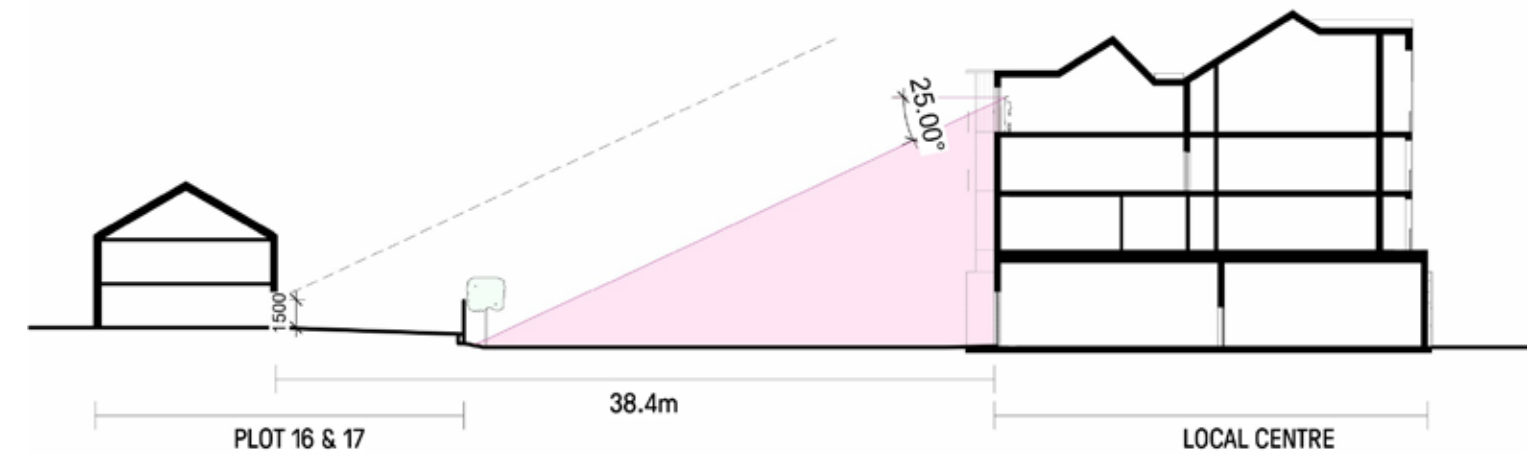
Local Centre & Plot 16 & 17 Third Floor Privacy Section prepared for Design Workshop
